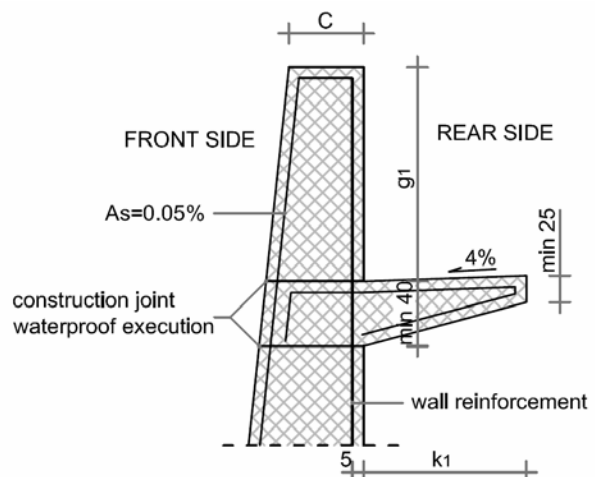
Detail of reinforced concrete gravity wall with a rear cantilever
